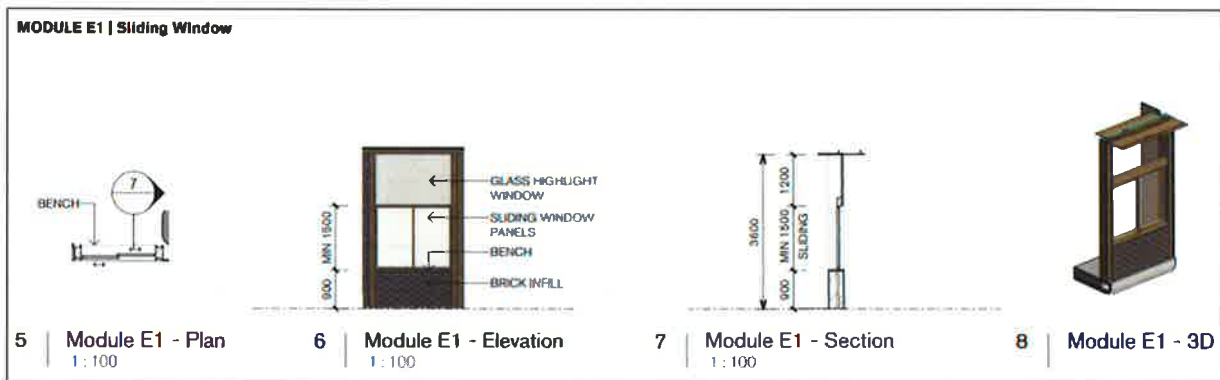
| Proposed new Shopfront Module E1 (Source: Applicant)
